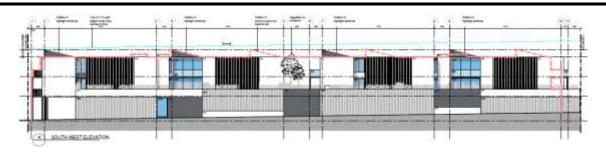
South West Elevation of DA 10.2017.116.1 – original plans (Pink line shows DA 10.2012.264.1)
